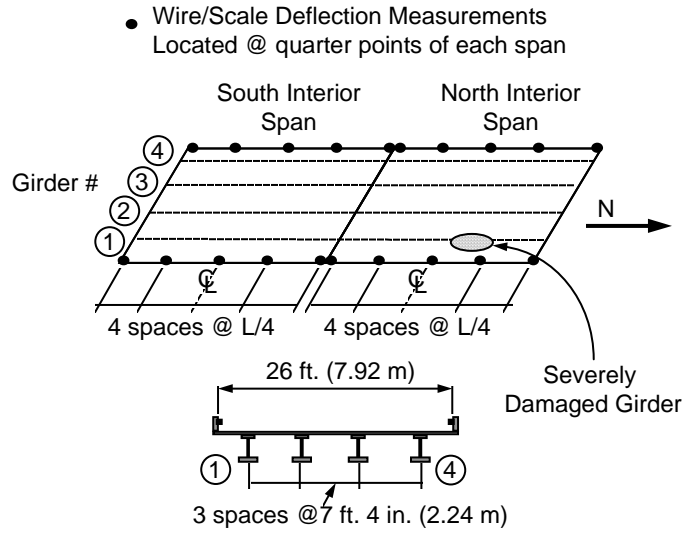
28 Plan and transverse sections of Waelder Bridge showing locations for deflection measurements
